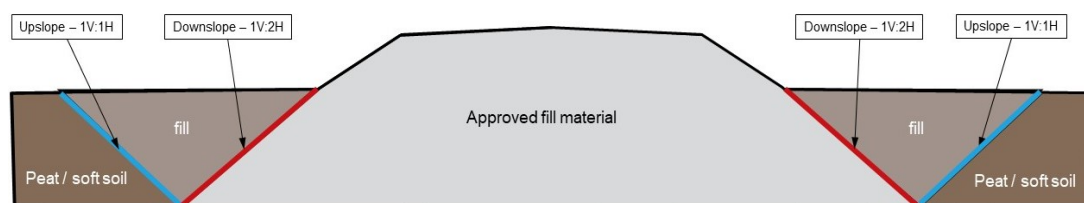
Assumed Soft Soil Excavate and Replace Section
